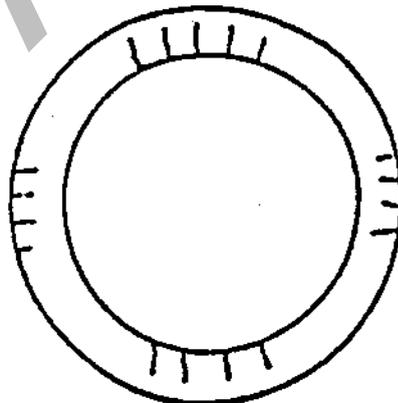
Cracking Pattern in Pipe Culvert
